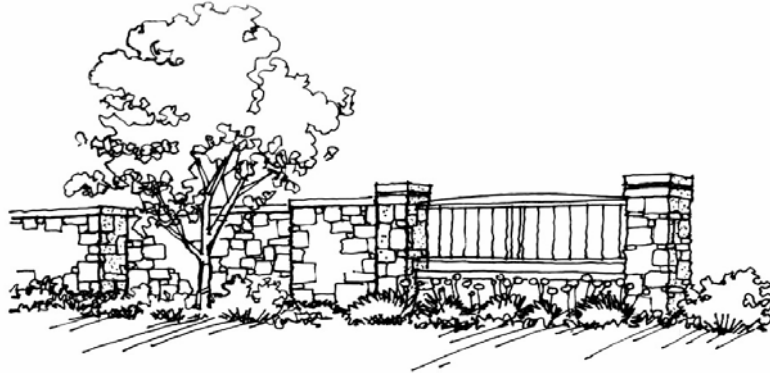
Walls and fences shall be constructed of high quality materials, such as decorative blocks, brick, stone, treated wood, and wrought iron.
